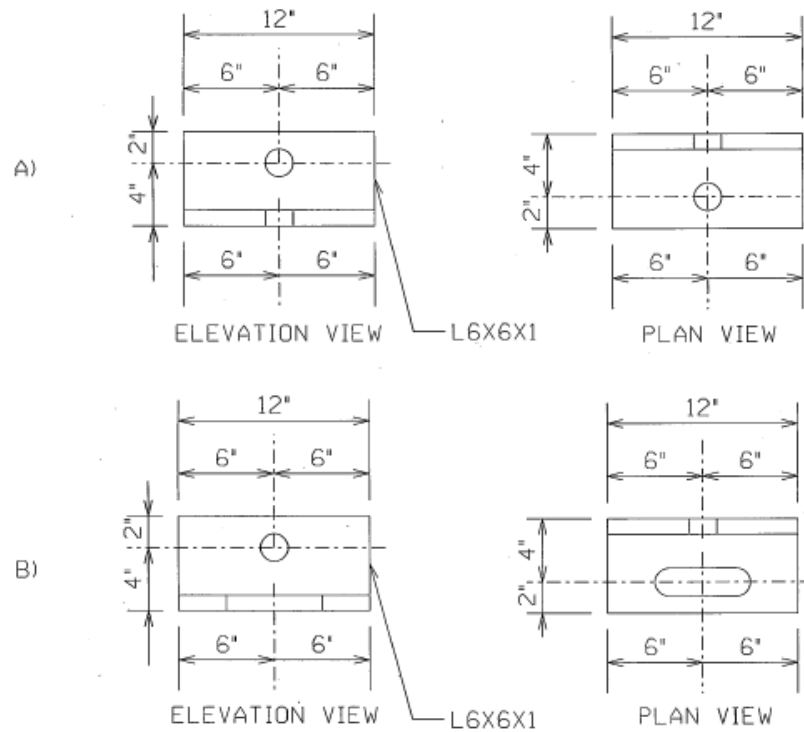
Little Bear Creek Bent 2 & 3 Connections for Type III Girders
